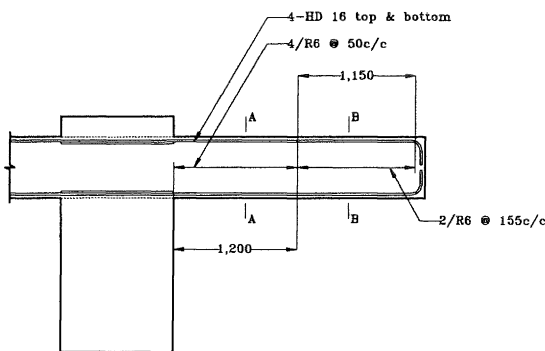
Reinforcement Layout in Test Sub-Assemblage.
